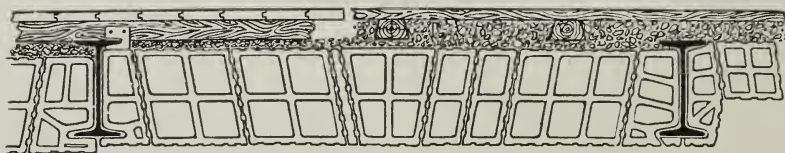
Tile Floor Arch—Typical Side-construction Section.
